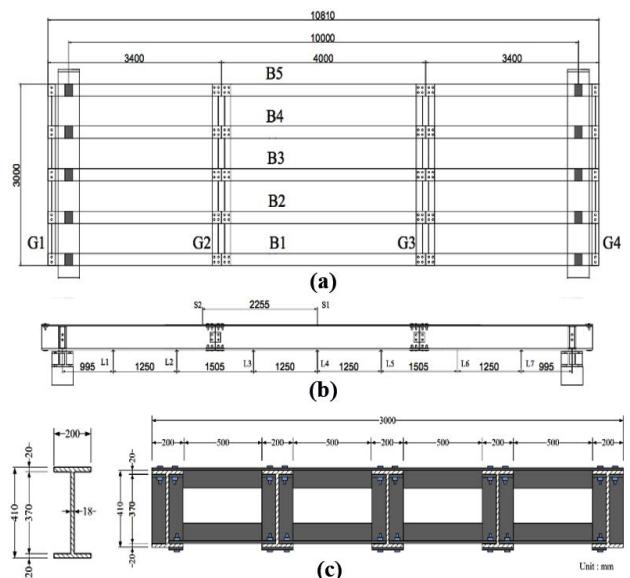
Temporary bridge: (a) top view, (b) longitudinal elevation, and (c) cross-section. Source: [18].
